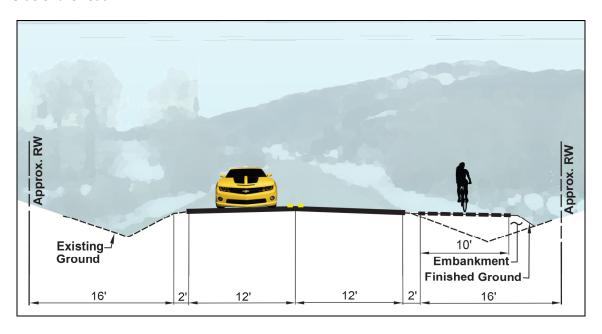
Nash Road looking east (typical section S5-a), a section with minimum ROW width of 60'
